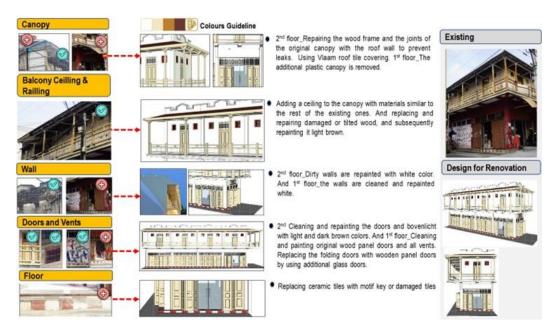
Identification of Facade Damage of the Windiastuti Shop House Source: Author, 2023
